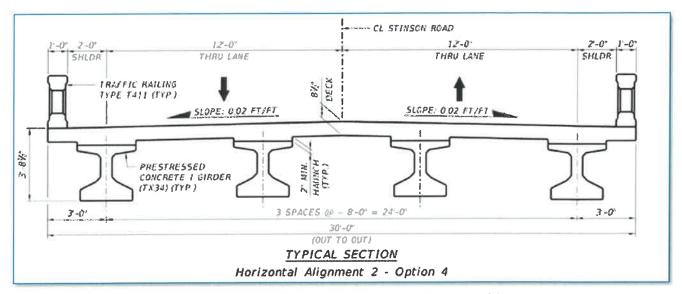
TxDOT Prestressed Concrete I-Girders (TX34) Typical Section
